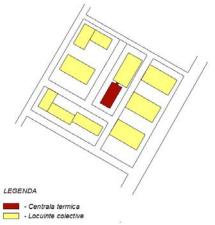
Example of central heating plant location in the quadrant of collective dwellings
